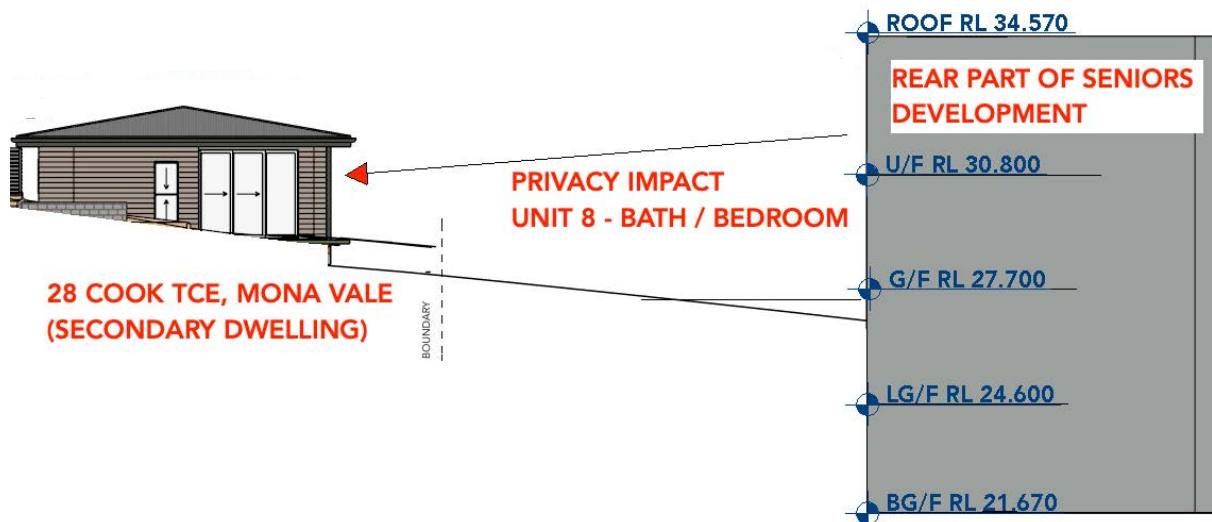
PRIVACY IMPACT VIEW LINE – SECONDARY DWELLING
